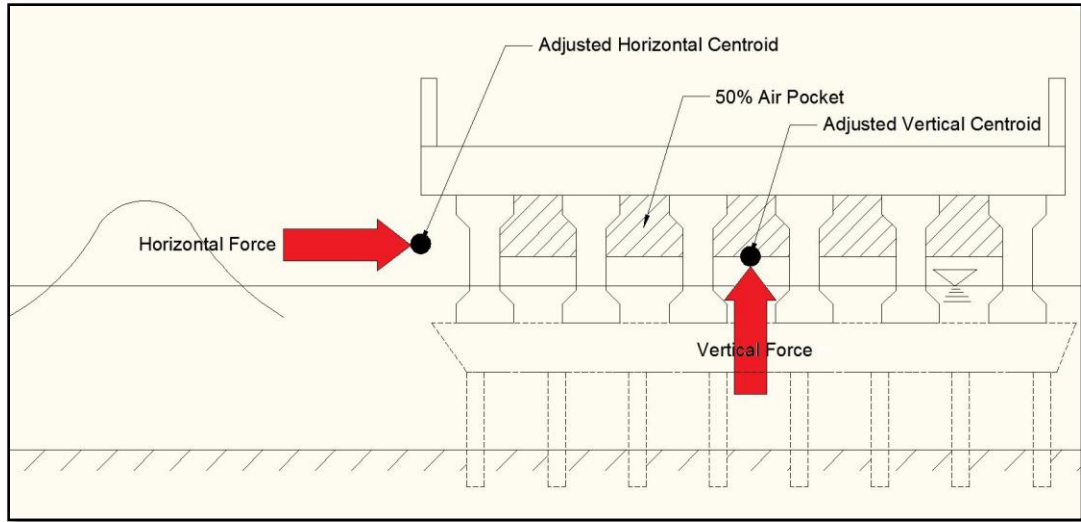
Adjusted Bridge Centroids for Douglass' Method
